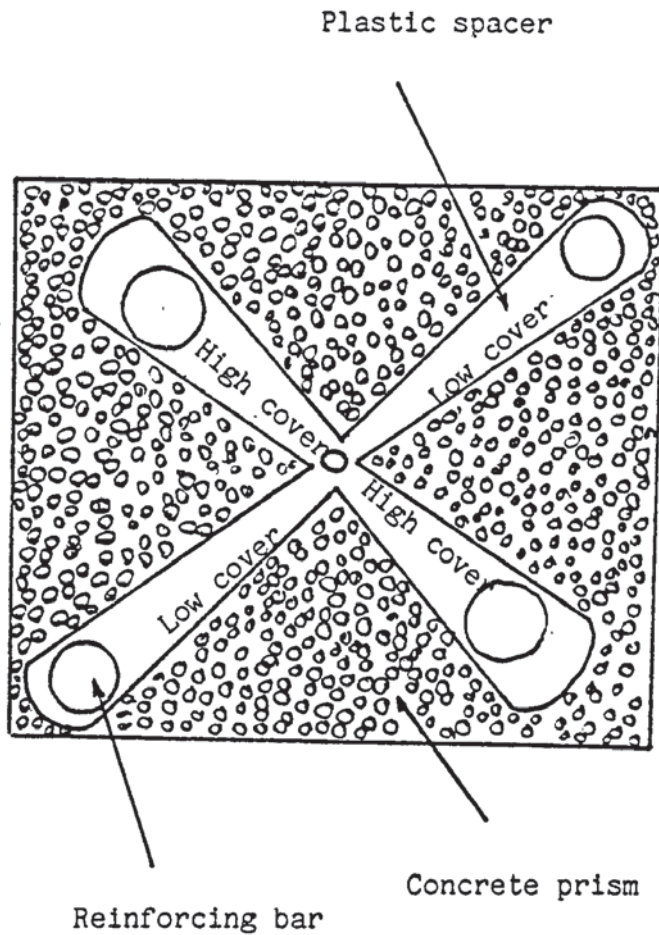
End section of concrete prism showing how one specimen provides two depths of cover for the steel reinforcement
